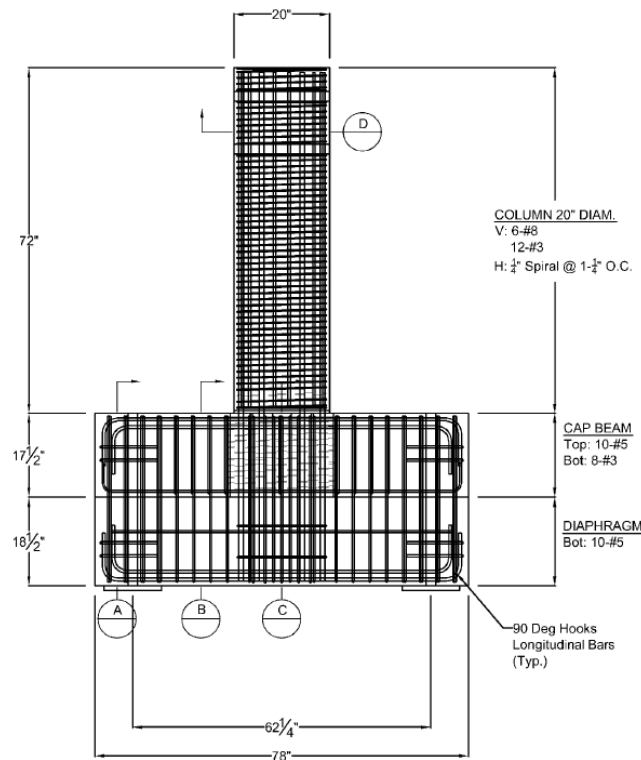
Specimen PCC-CB-FB elevation (Pang et al. 2008)
